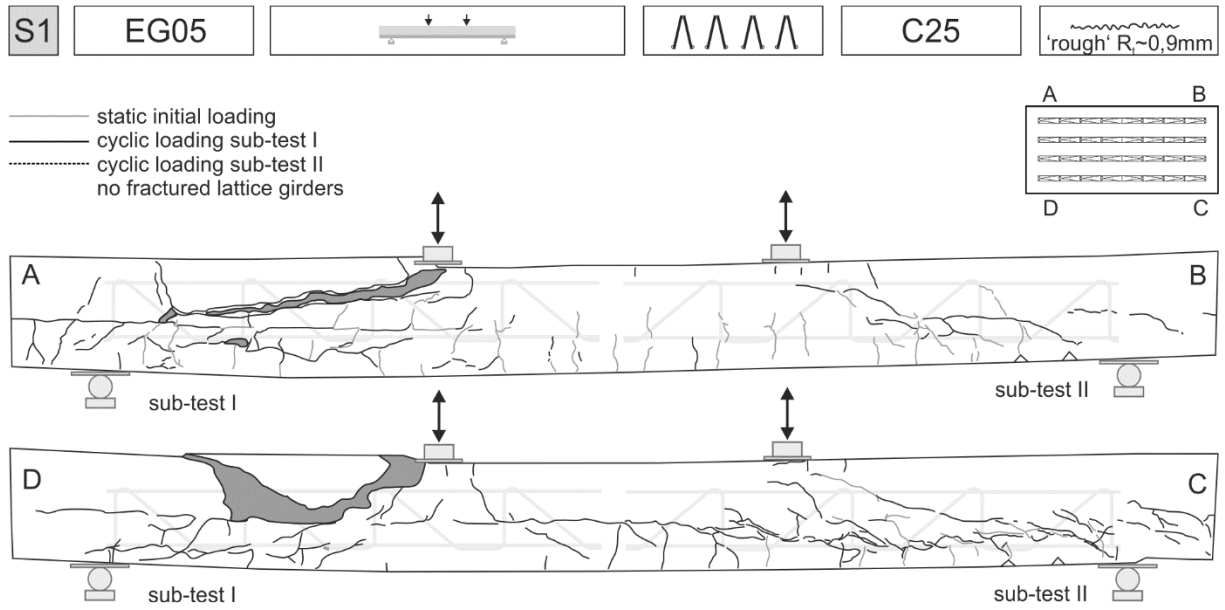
Test parameters, crack patterns and lattice girder fractures of specimen EG05
